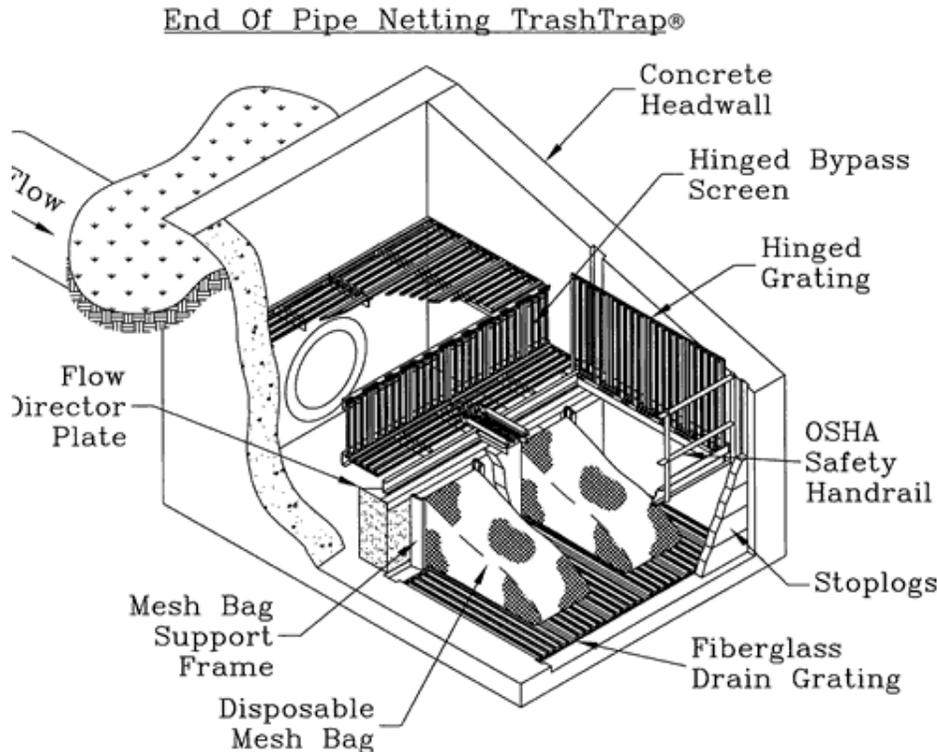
Proposed Netting System to be Installed at Project 77/510 Storm Drain Outlets
